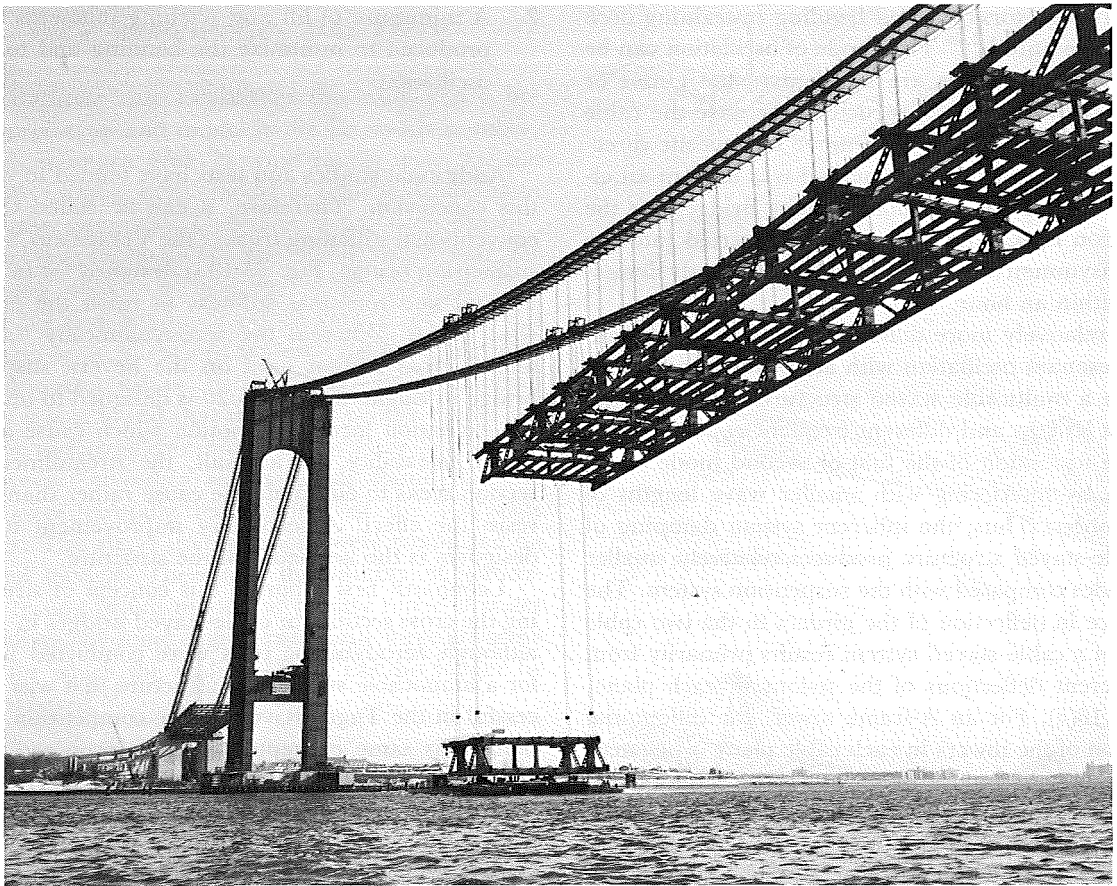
Verrozano Narrows Bridge, New York.
